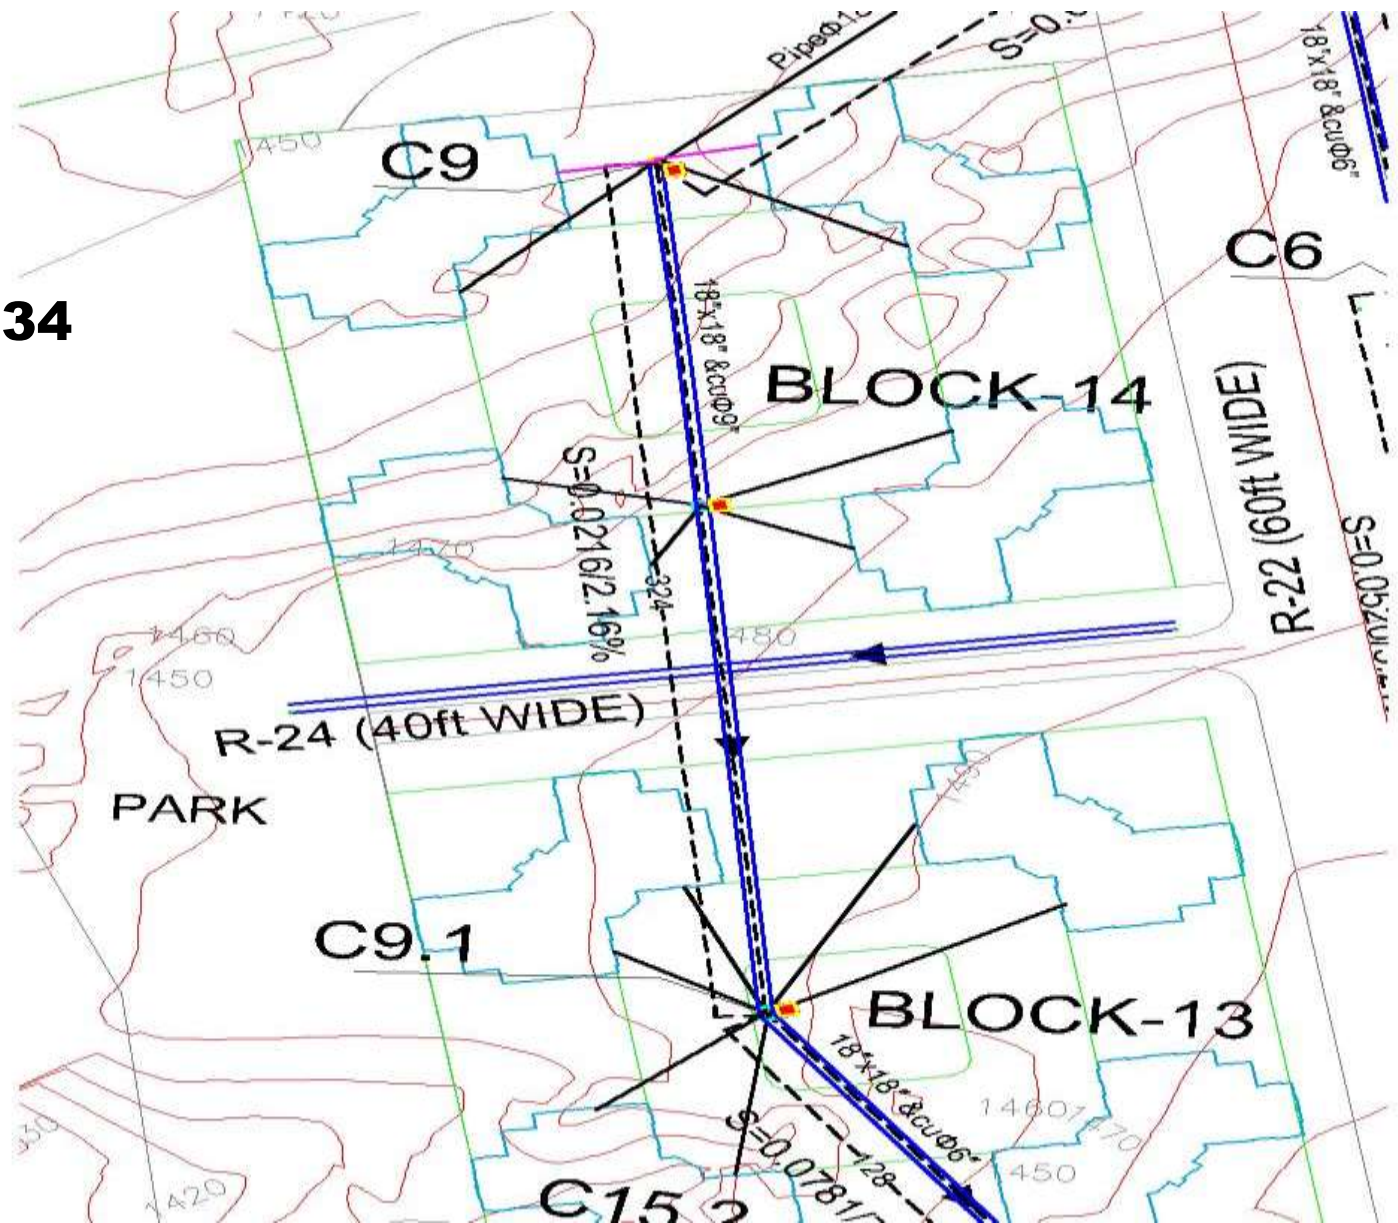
Combined drainage layout plan of Zone-3 through Block-13 & 14
